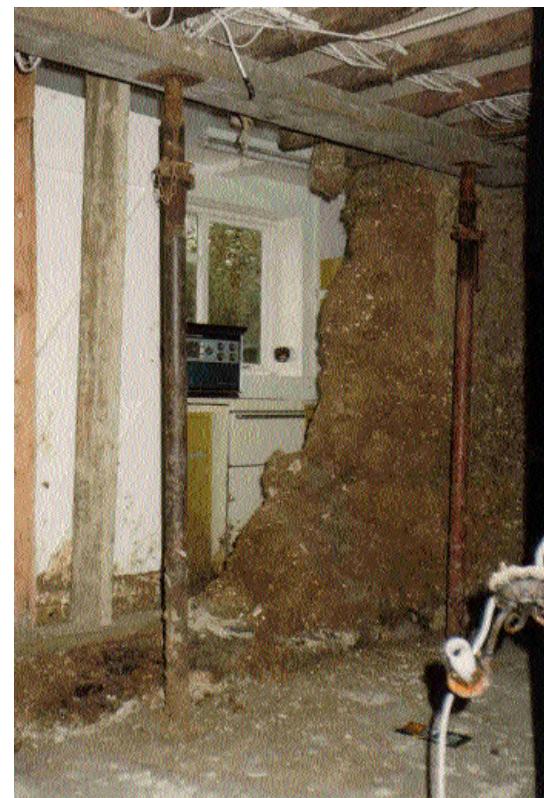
Result of frost damage to a plumbing system at first floor level above a cob wall
